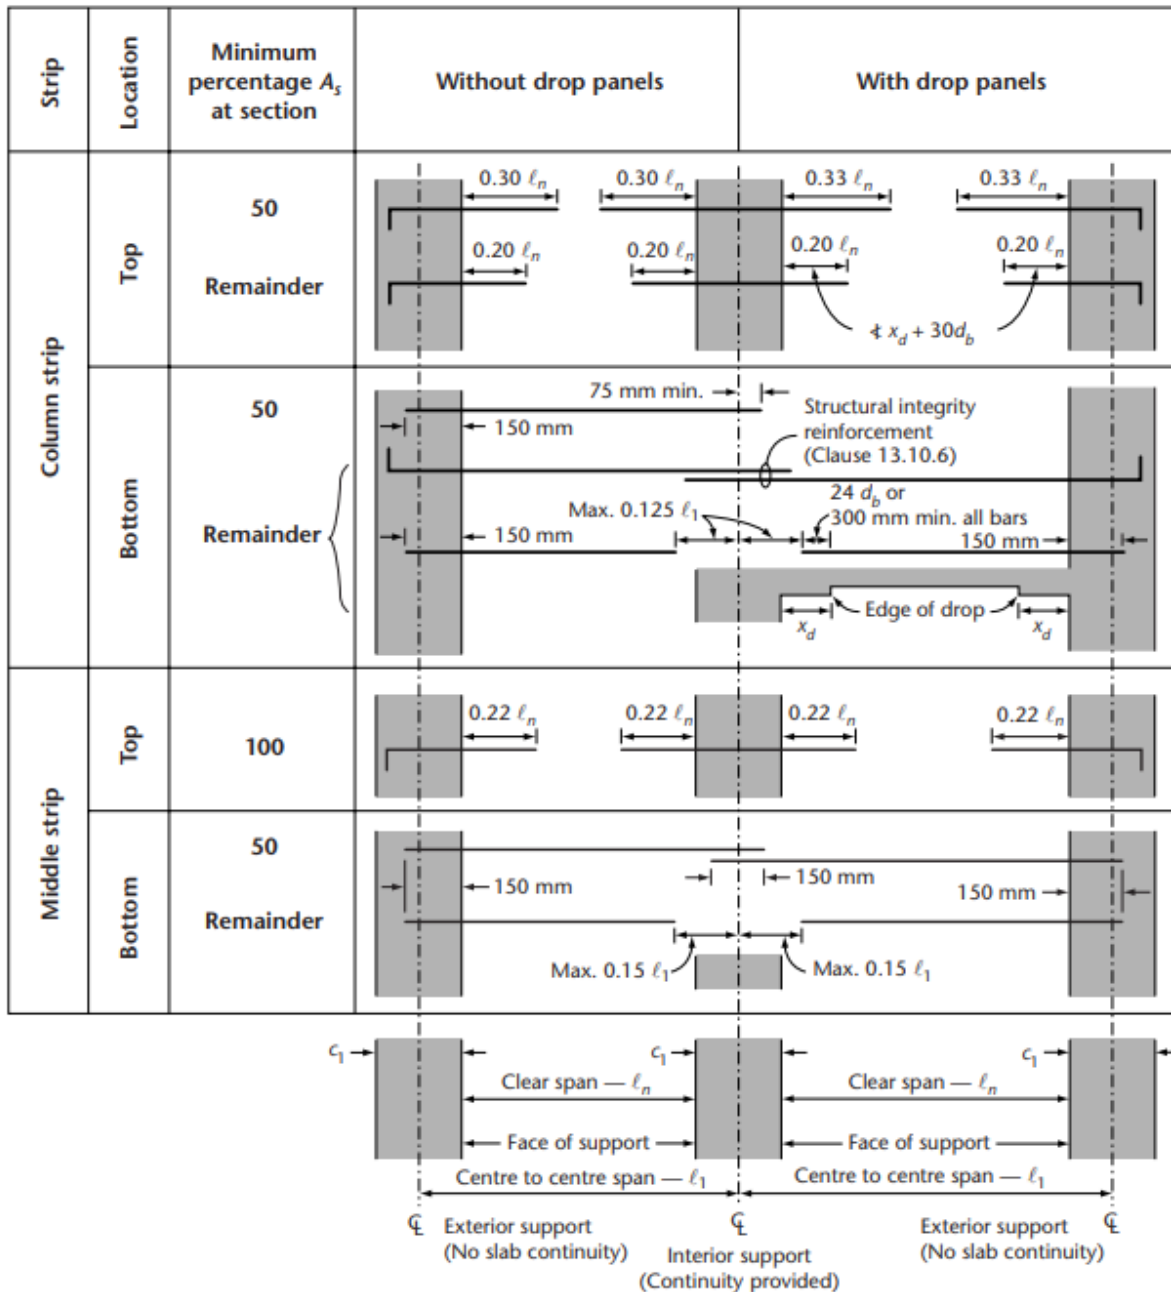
Curtailment of Slab Reinforcement (CSA A23.3-14)
